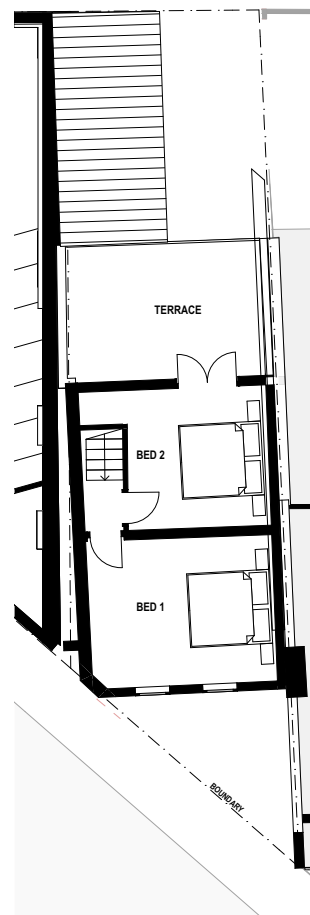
12 Nimrod Street, existing level 1 plan.
